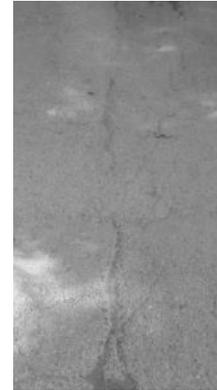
Typical longitudinal cracking observed on an asphalt pavement
